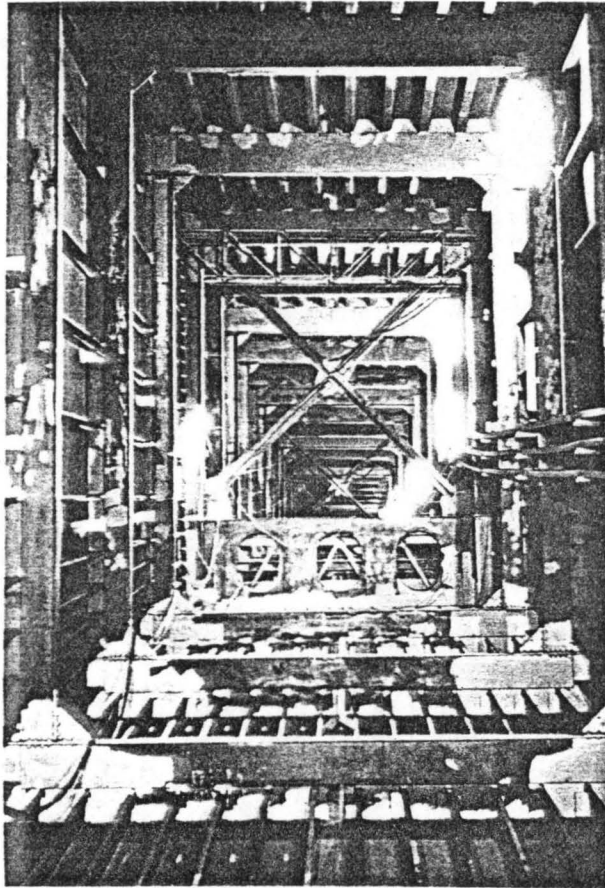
View Inside North Box and of Instrumented Section at FB51 (First Section with Cross Bracing and Oval Holes in Transverse Girder)
